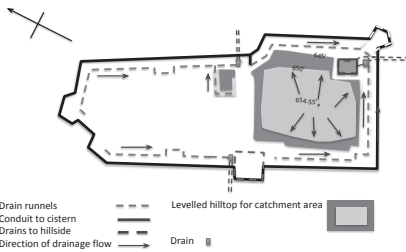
Drainage System for rain water showing levelled off southern hill top sloped west to east
